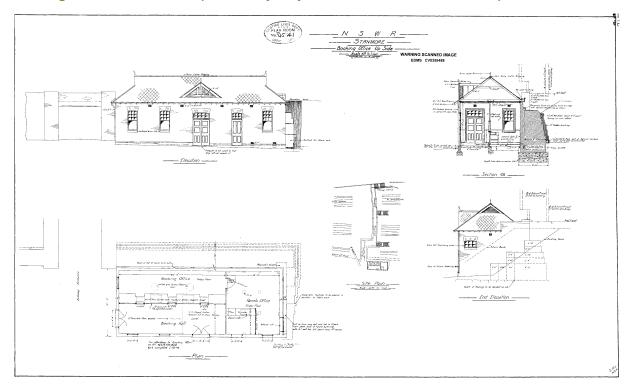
A 1913 plan of the booking office at Stanmore Station constructed in 1913 (Source: Sydney Trains Archives, 0359488 A0C)
